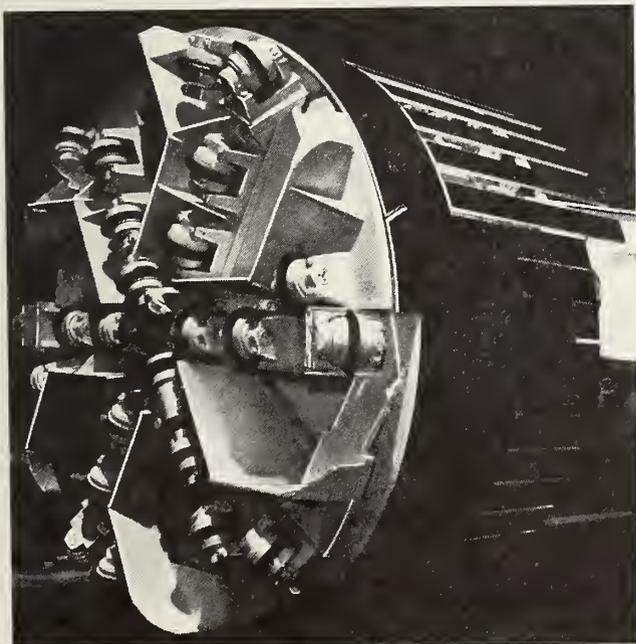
Segmented Cutting Head Shield, with Gripper Plate, and Radially Sliding Segments
